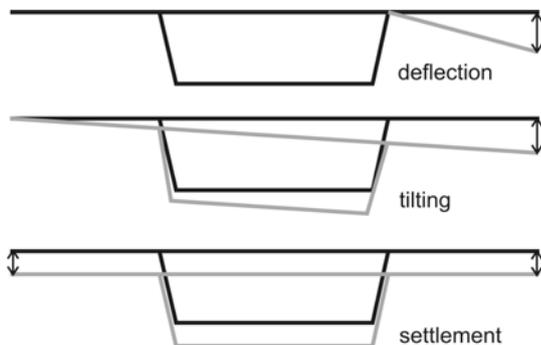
Expected deformation behaviours of the cantilever slabs and bridge girder under loading.
